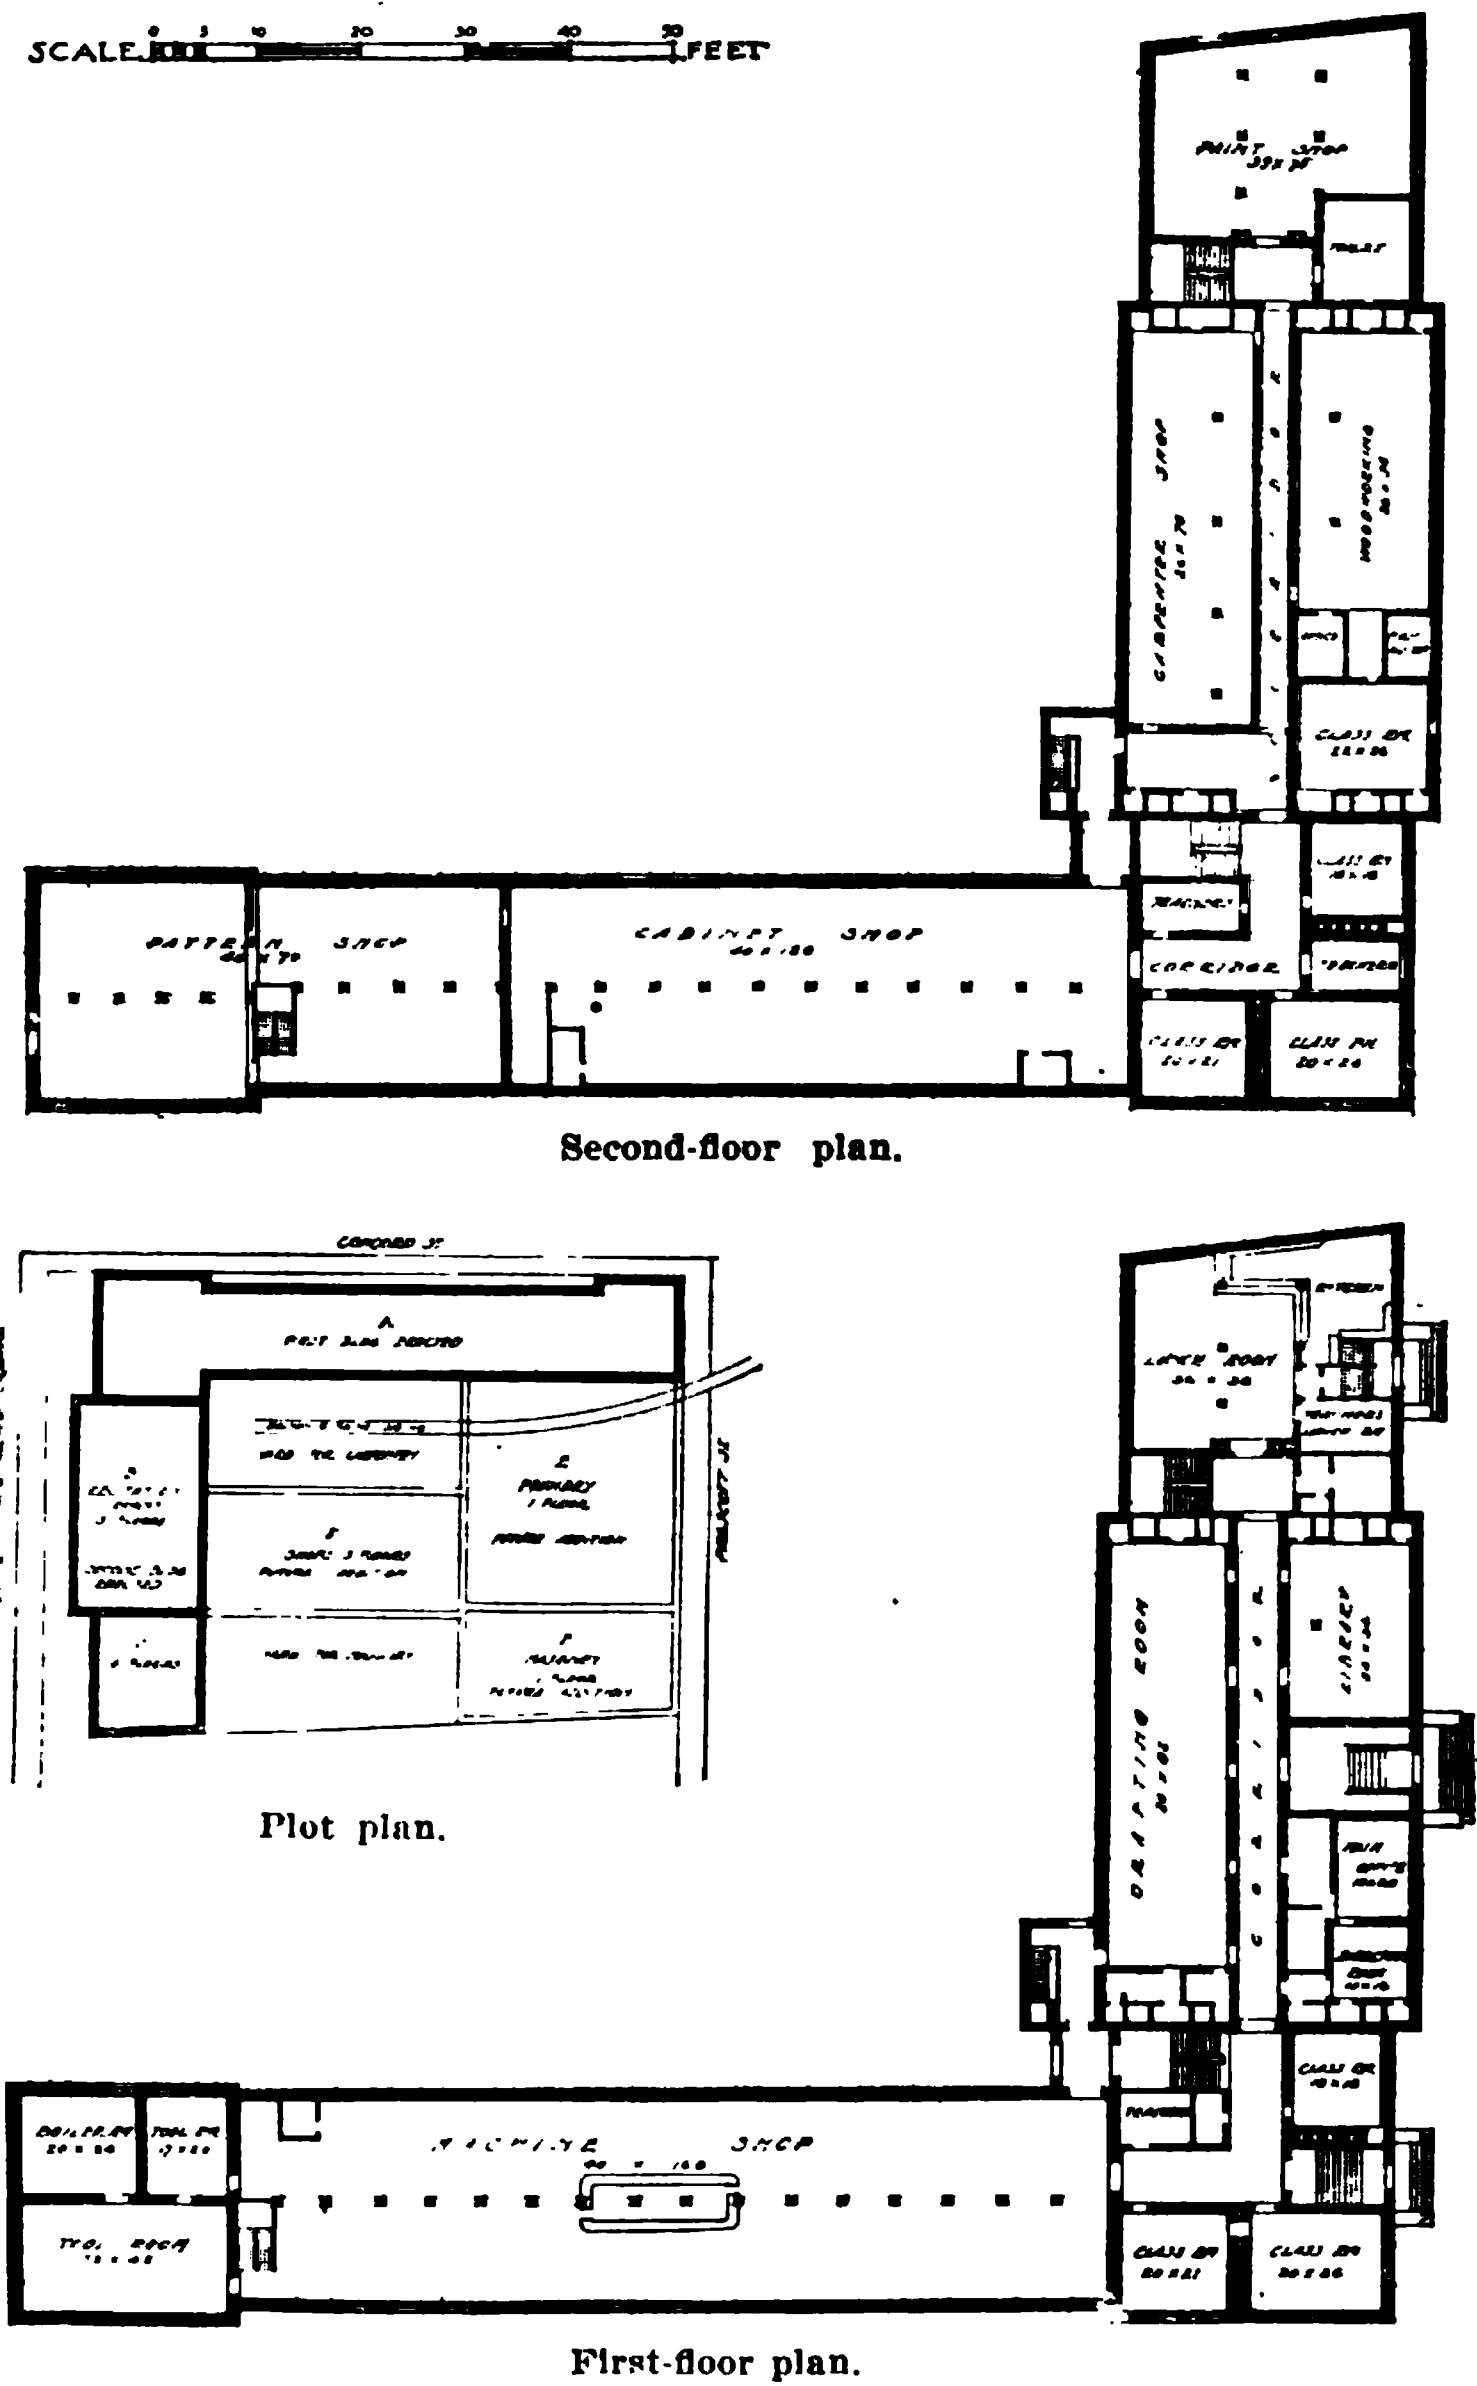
Floor plans of Worcester Boys' Trade School.
